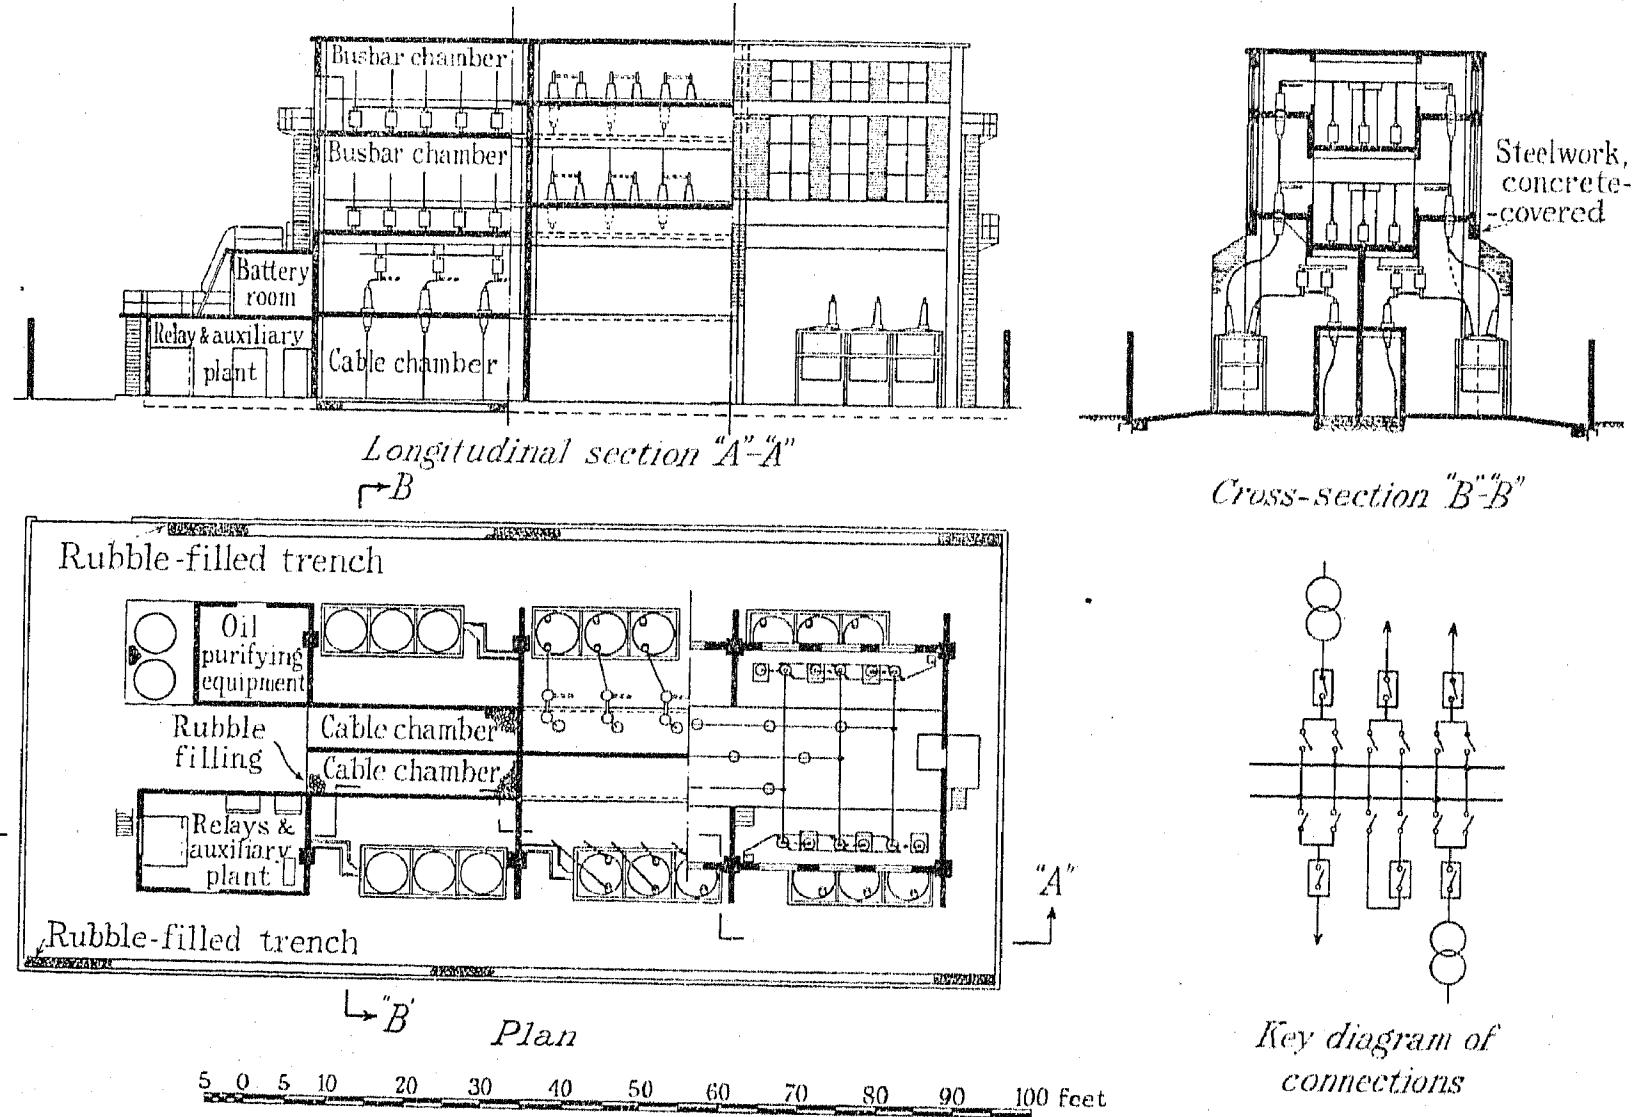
Typical arrangement of 66-kV substation using indoor open-type switchgear.
